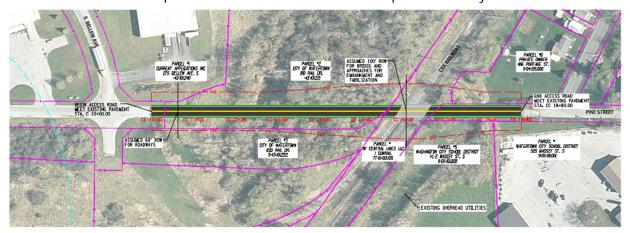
Alternative 6B – Access Road over CSX Railway via Pine Street
